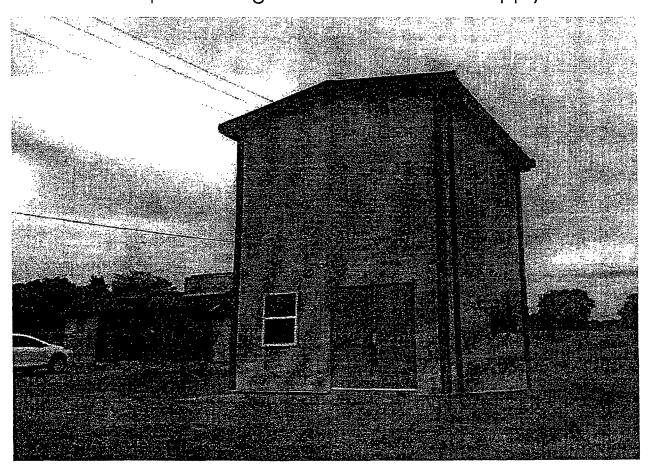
Air Stripper building with Well No. 1 and Generator building in background
